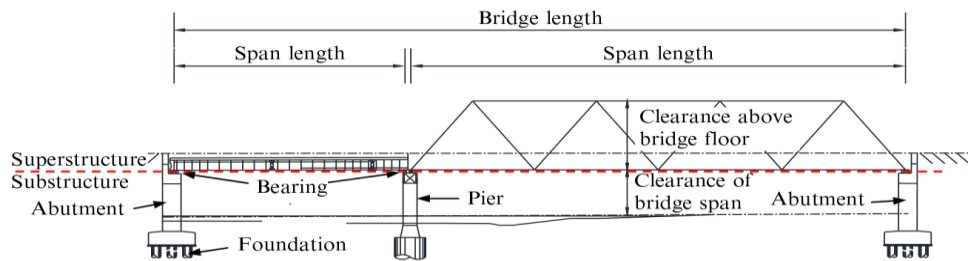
Longitudinal section of a bridge highlighting the major components of a bridge (Lin and Yoda, 2017)
